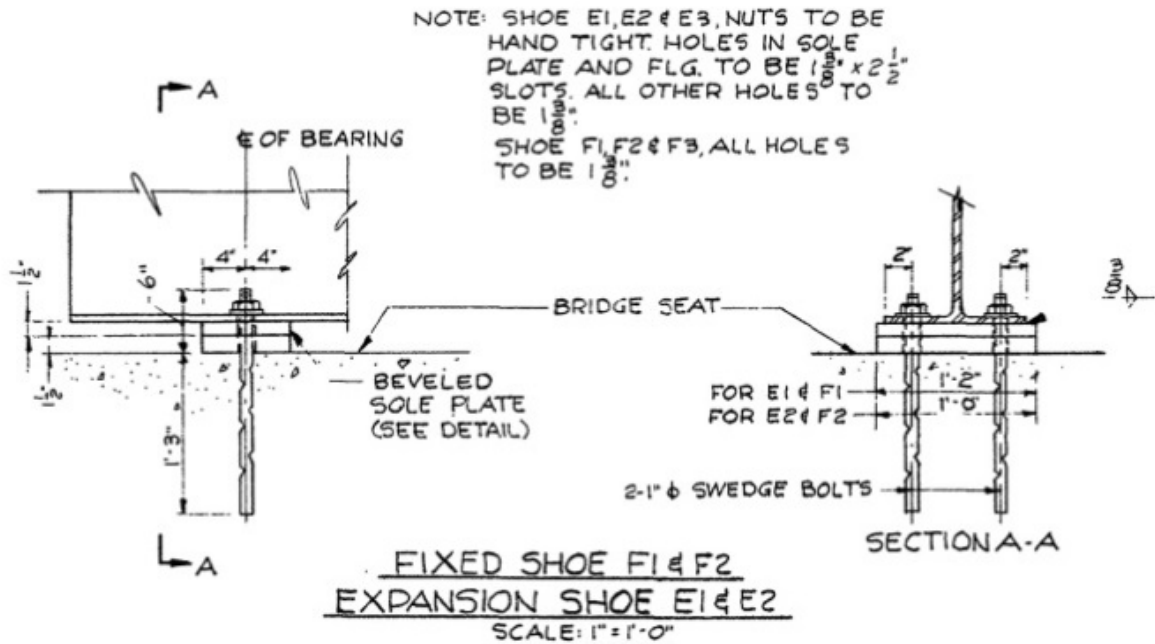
Bearing drawing details from B-10-18, showing bottom flange of girder, the two bearing plates, and anchor bolts. Note describes the holes, which allow the longitudinal translation.
